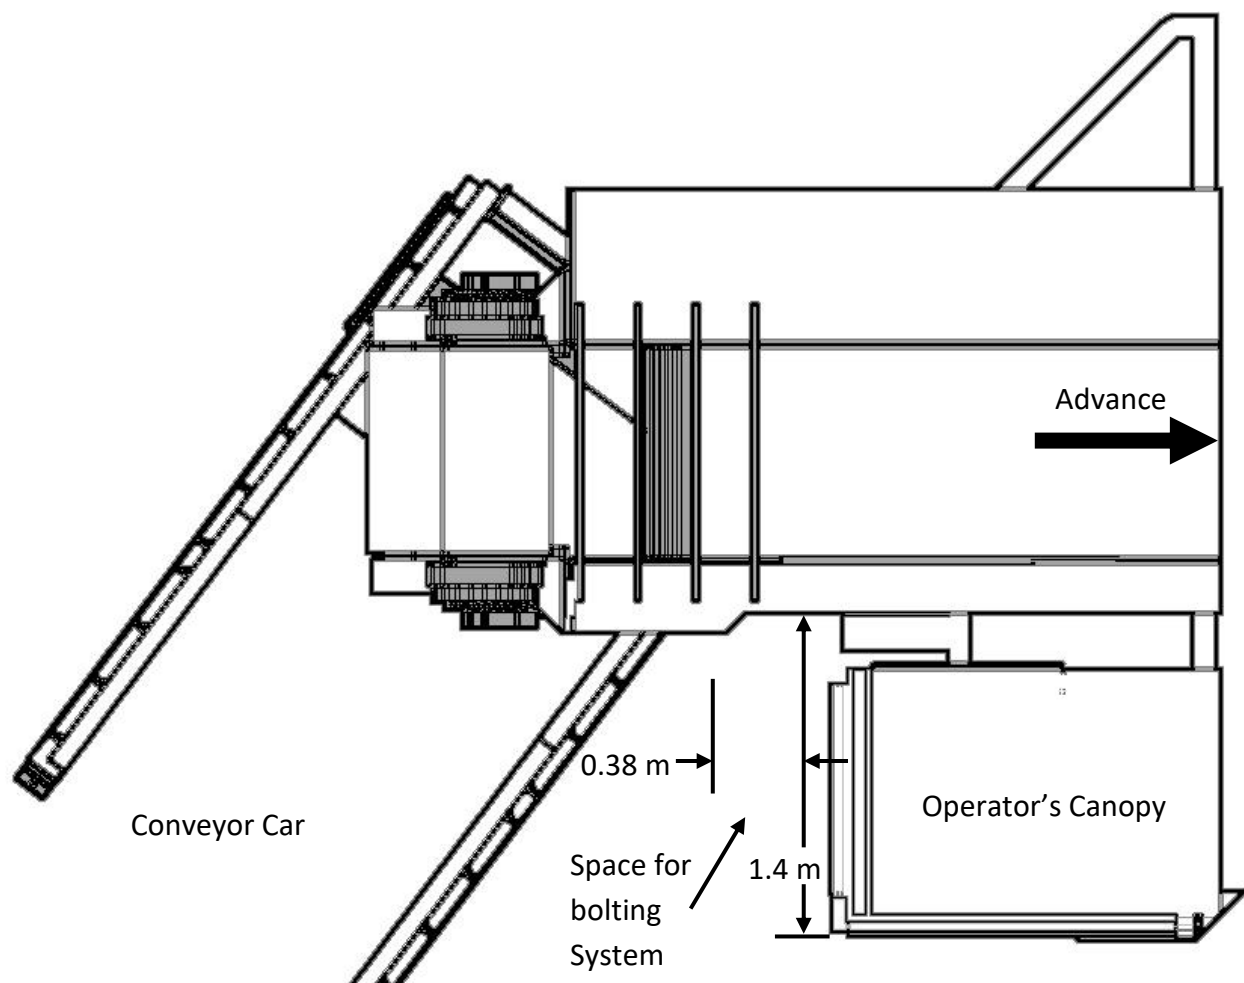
Top view of borer rear and conveyor car. Like a vehicle towing a trailer, as the turn angle becomes greater the conveyor gets closer to the back of the borer. The conveyor may be perpendicular to the borer in some cases.
